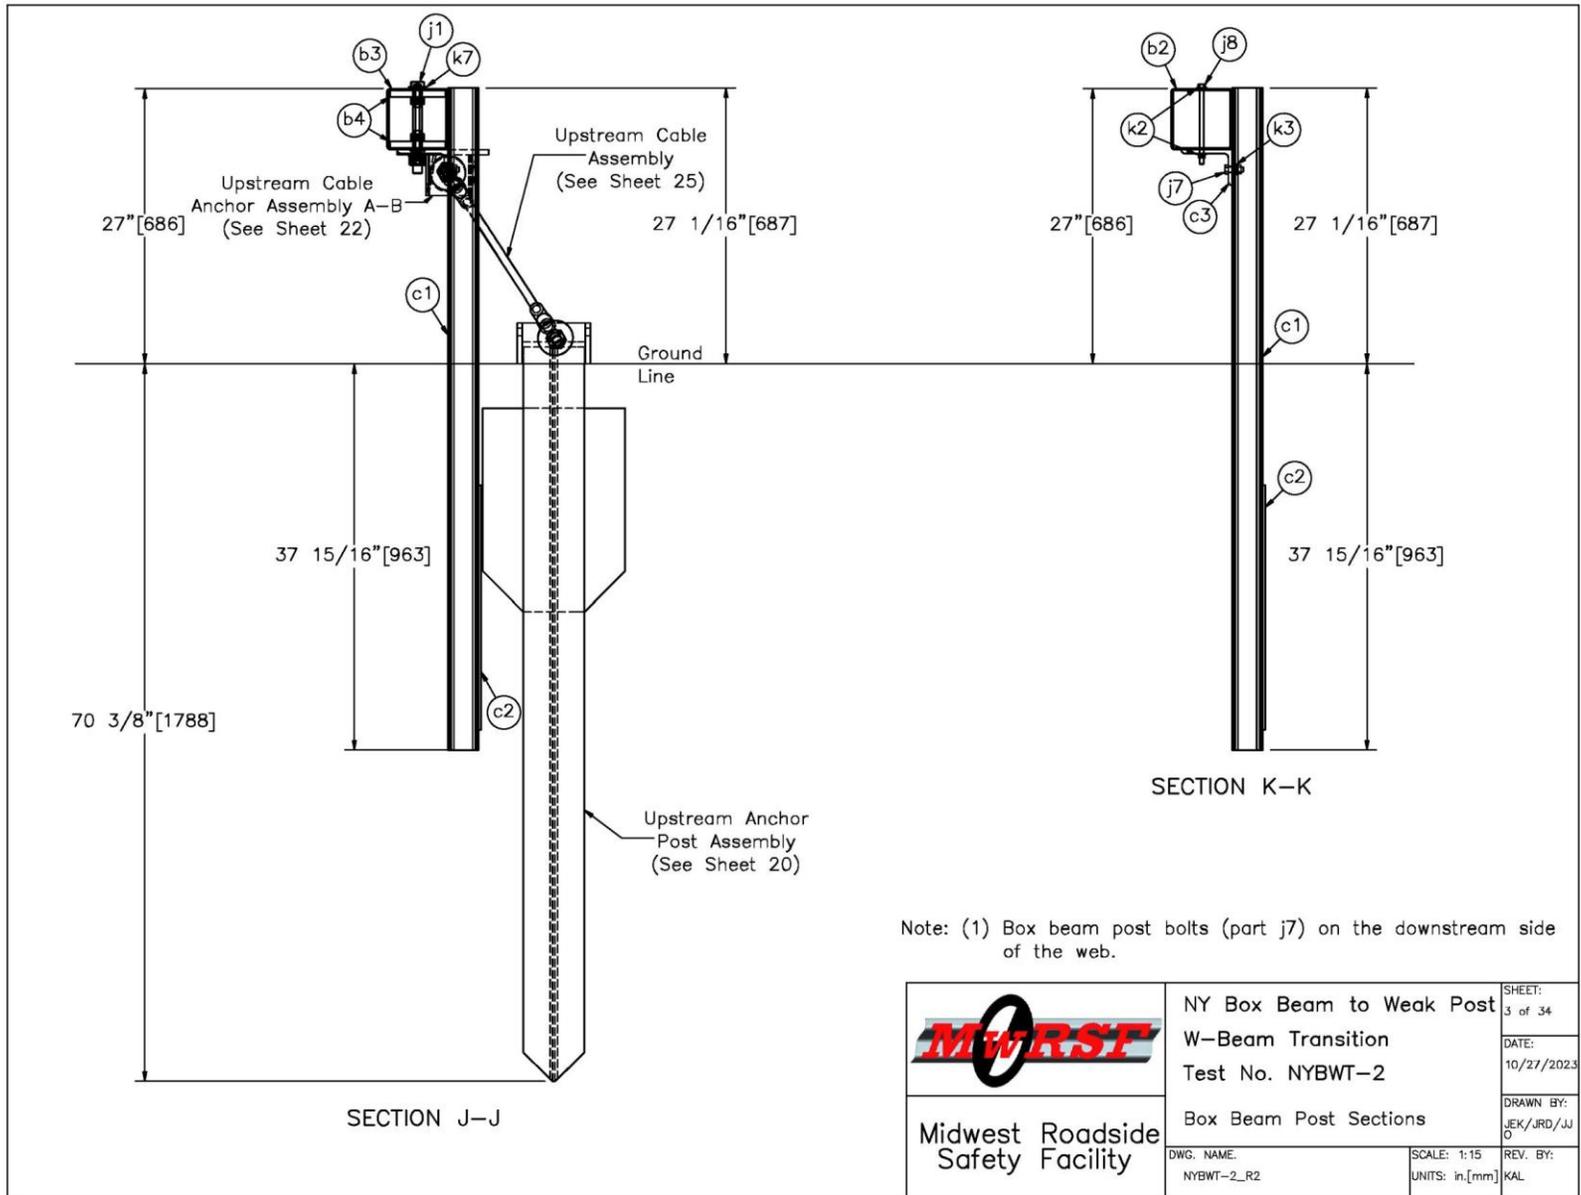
Box Beam Post Section, Test No. NYBWT-2
